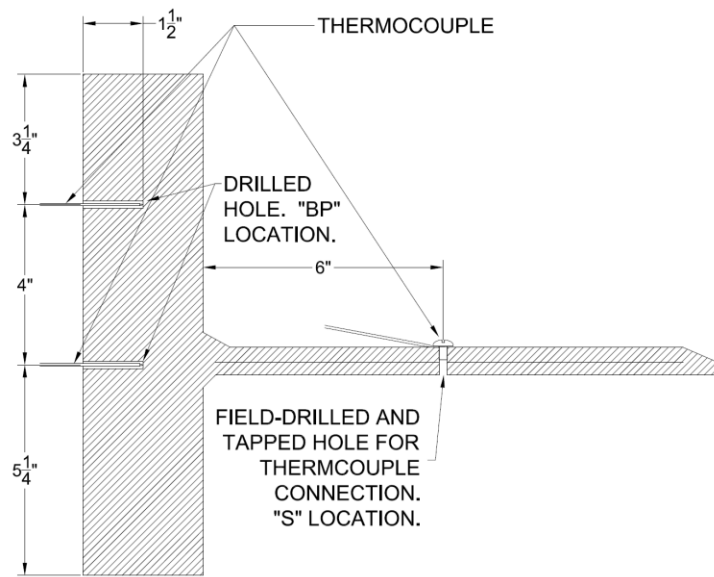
June 2010 typical thermocouple connection detail for 33-3-12-TXEC-SG-SA/SC specimens as in section A-A of Figure 5 19
